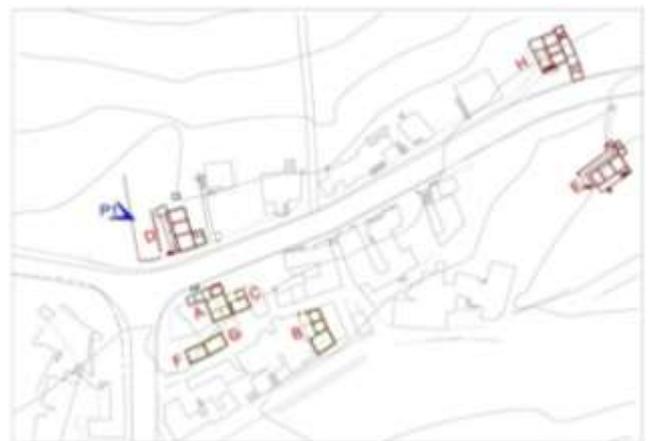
Site plan for the studied sample, shows prototype and first transformation dwellings.
